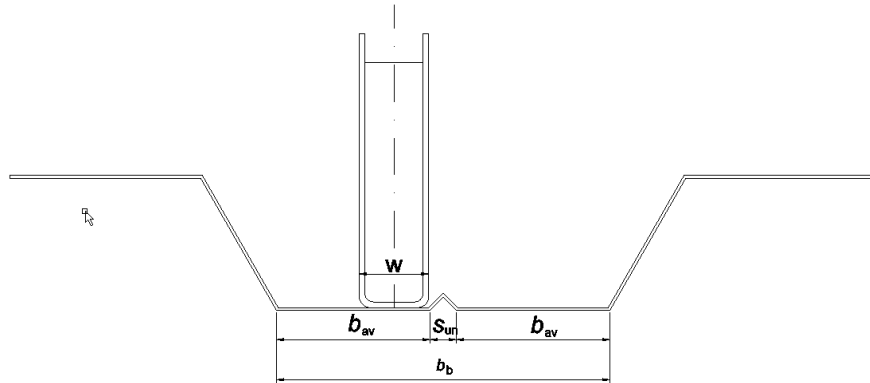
Transverse sheeting with one rib stiffener and transverse connectors.
